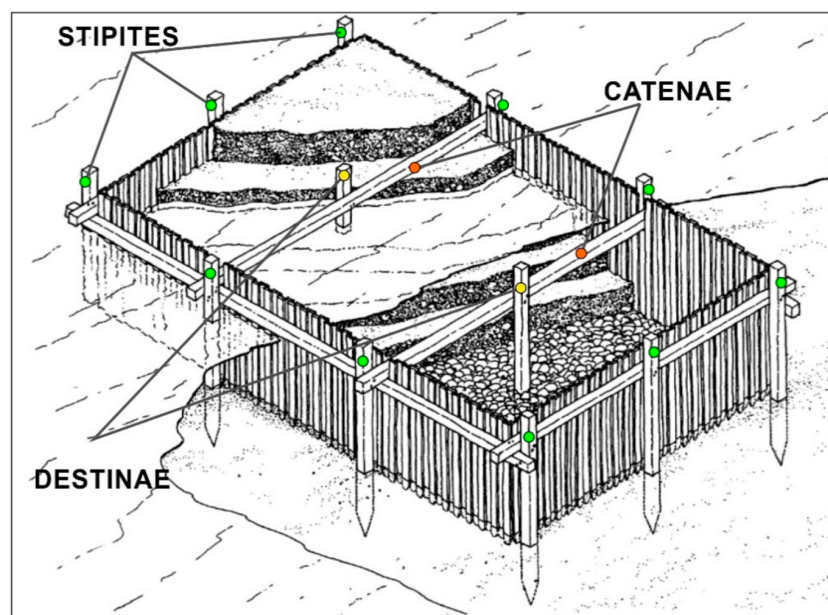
Vitruvius' cofferdam for hydraulic concrete. Reconstruction (after [39]).
